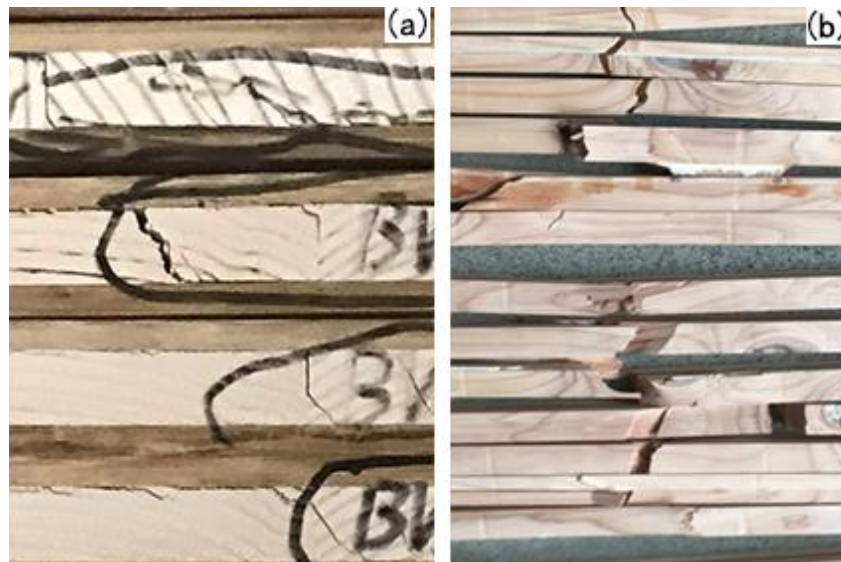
Clear damages of the bending specimens: (a) BWB damage and (b) WBW damage.
